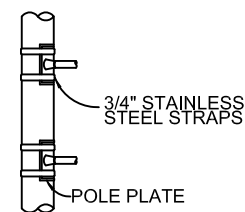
DETAIL OF MAST ARM MOUNTING FOR IN-LINE SIGNAL HEAD (3-SECTION OR 5-SECTION)
